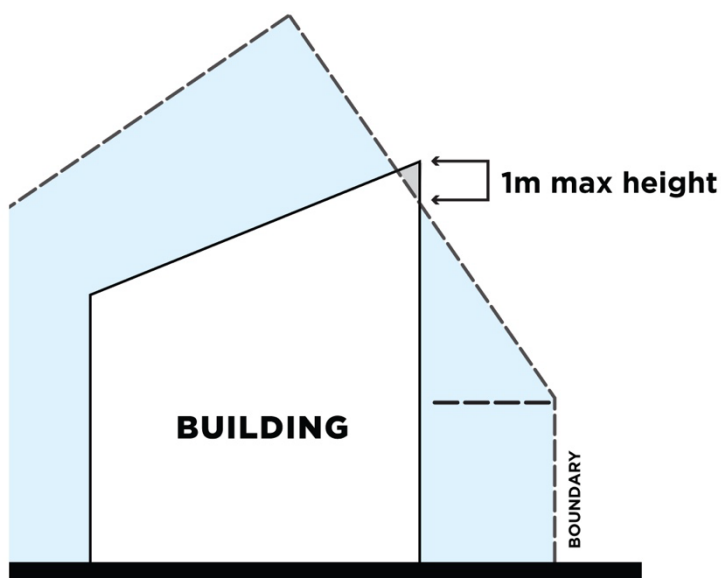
ELEVATION drawing showing a maximum projection height of 1m
